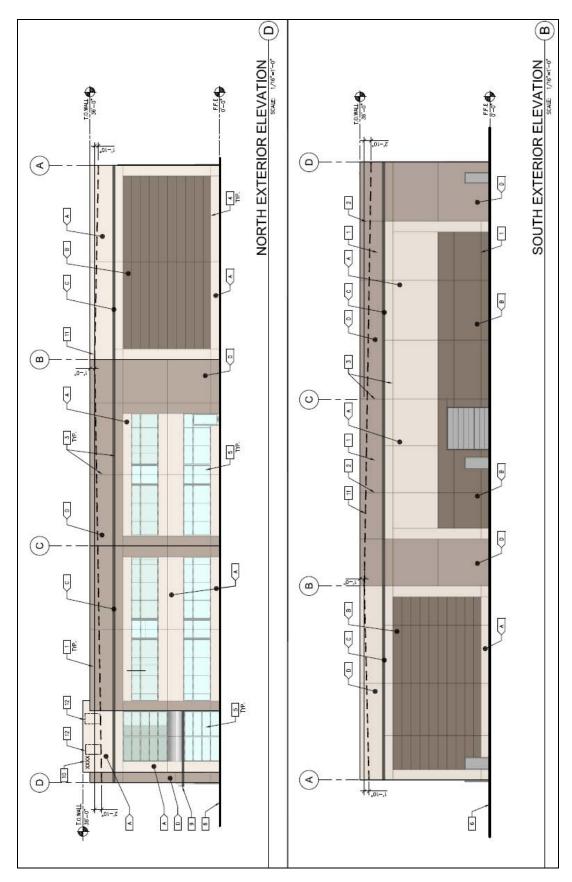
CONCEPTUAL BUILDING ELEVATIONS SOURCE: WARE MALCOMB
